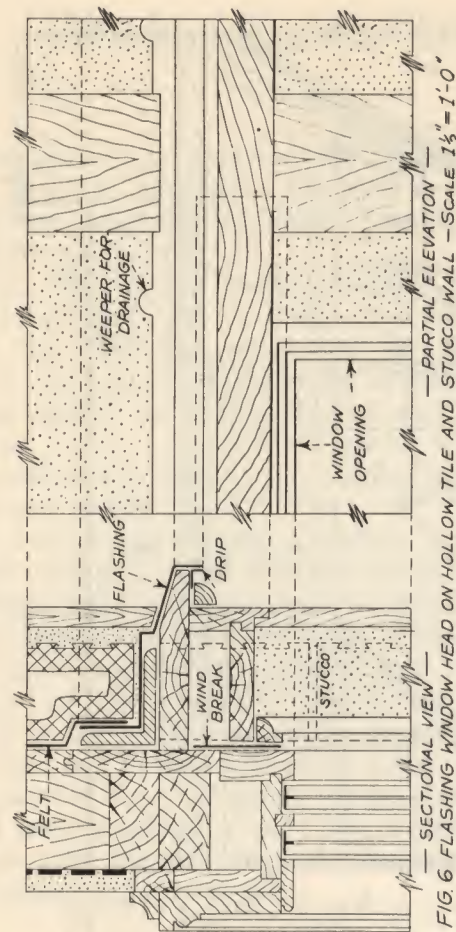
FLASHING WINDOW HEAD ON HOLLOW TILE AND STUCCO WALL — SCALE $1\frac{1}{2}'' = 1'-0''$
